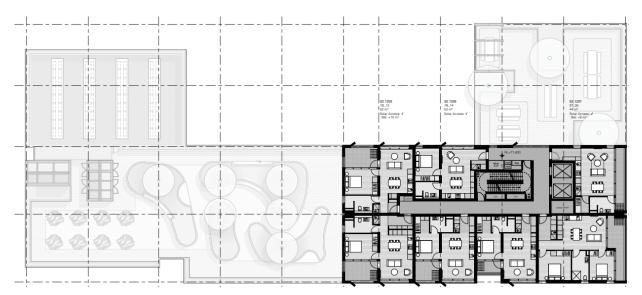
Building S2 – Typical Level Plan (Levels 11-13)
